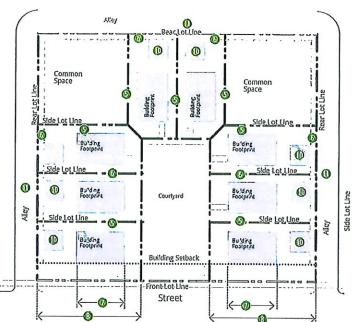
E. House C Court: Multiple Principal House C Buildings
